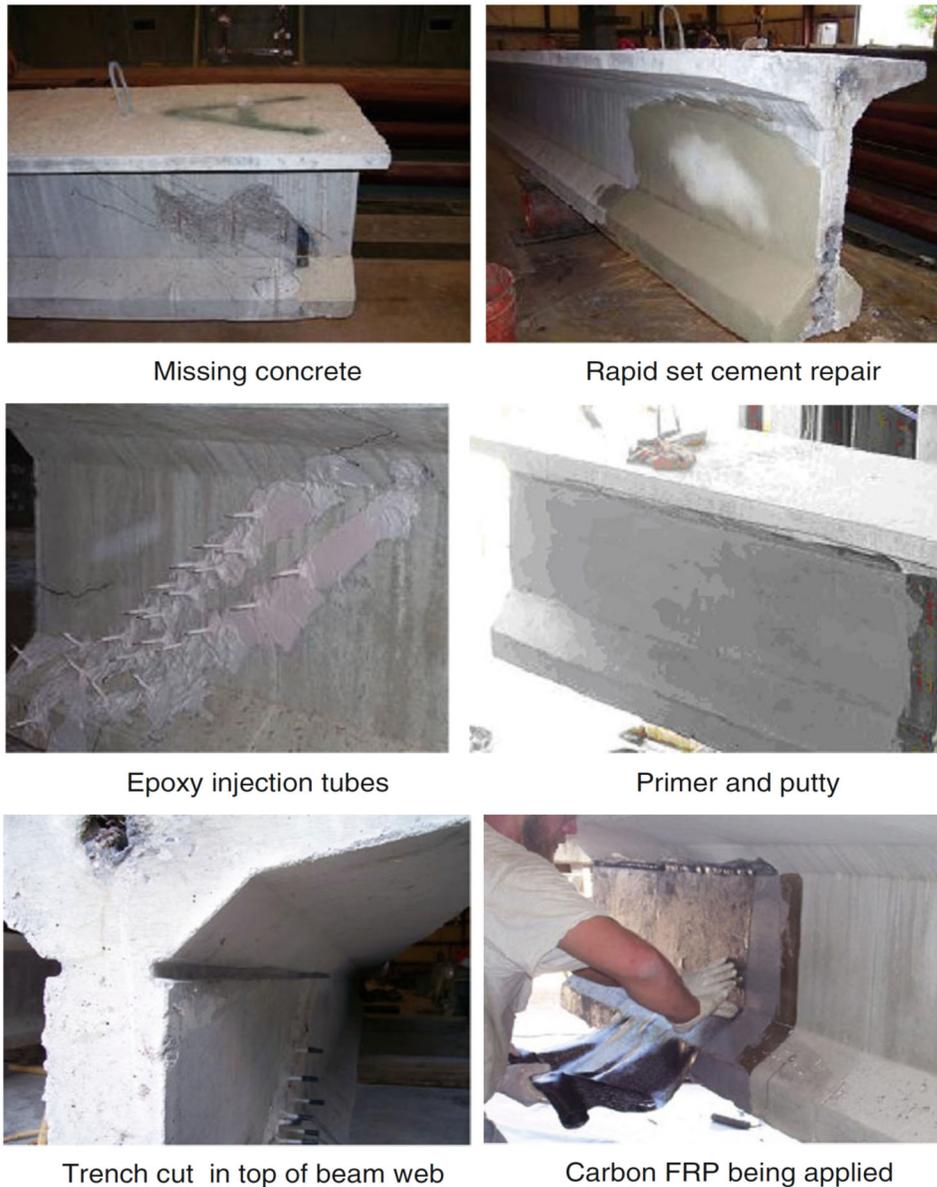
Strengthening of PC girders using CFRP wraps [23]
